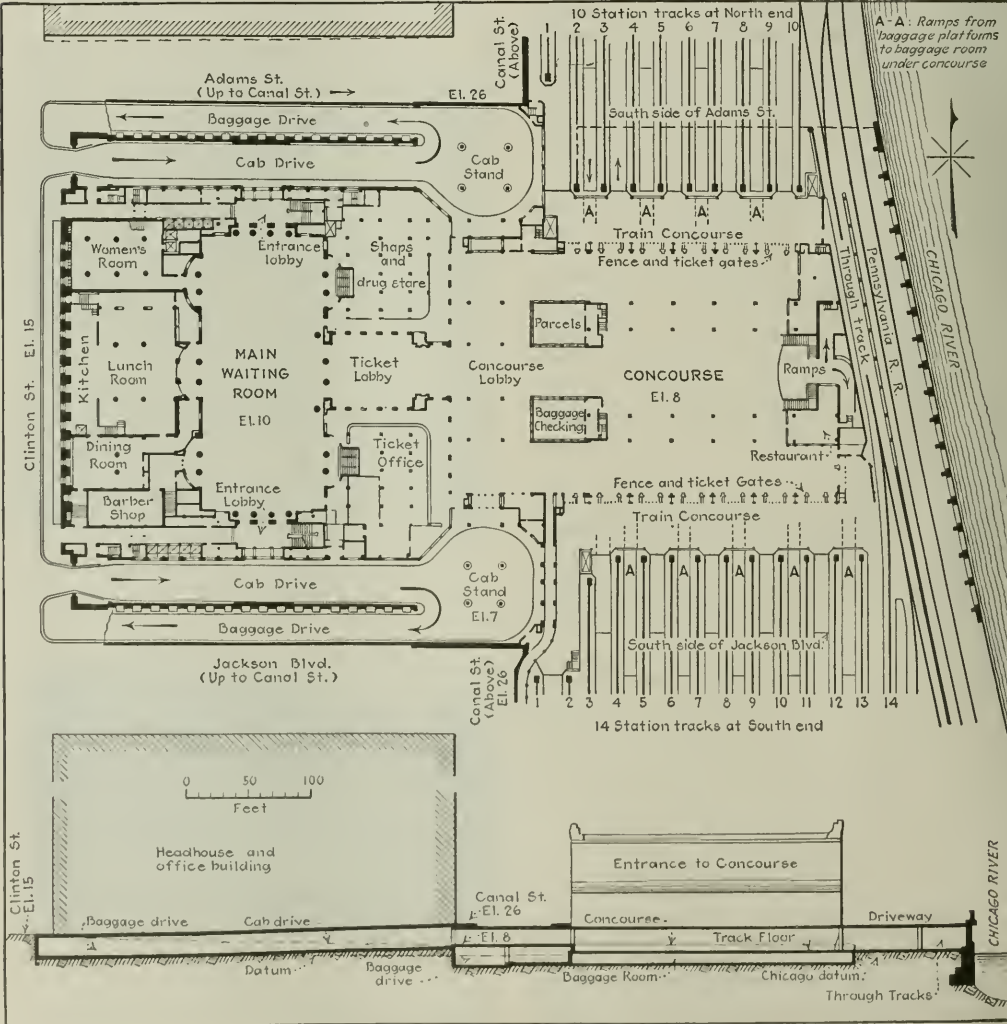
PLAN OF HEADHOUSE, TRACKS AND PLATFORMS
